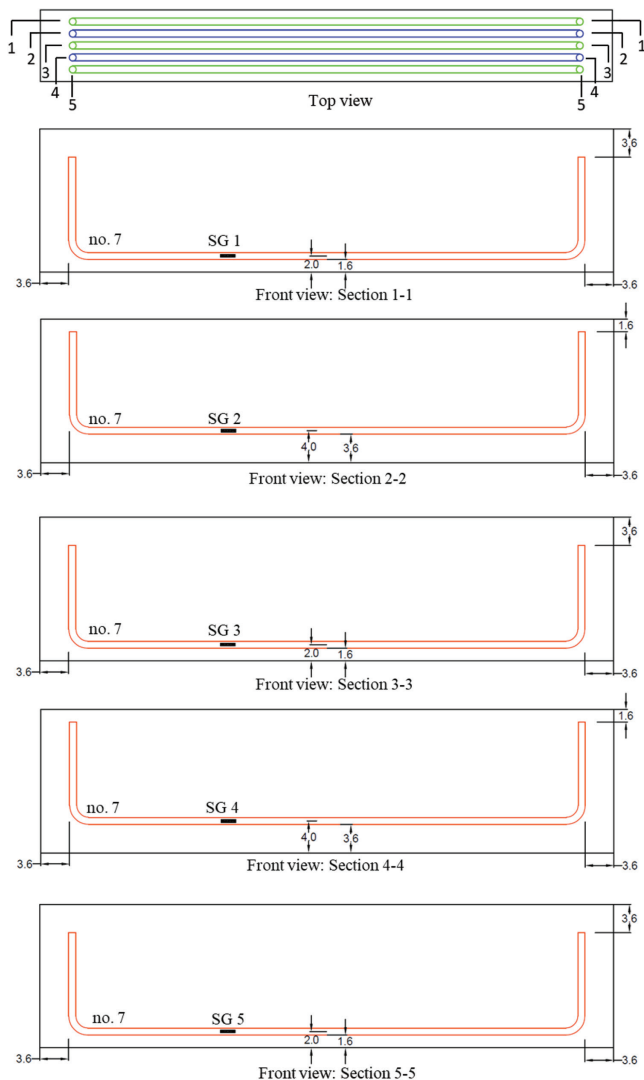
Reinforcement details of specimen with standard ACI STM layout. (Note: Labeled dimensions are in inches; 1.0 in. = 25.4 mm.)
